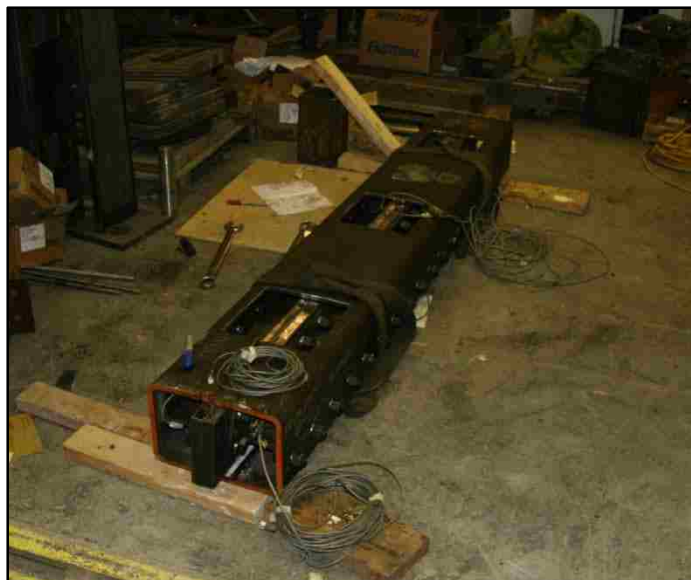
Baldwin Specimen After Attachment of Middle Plate to HSS
